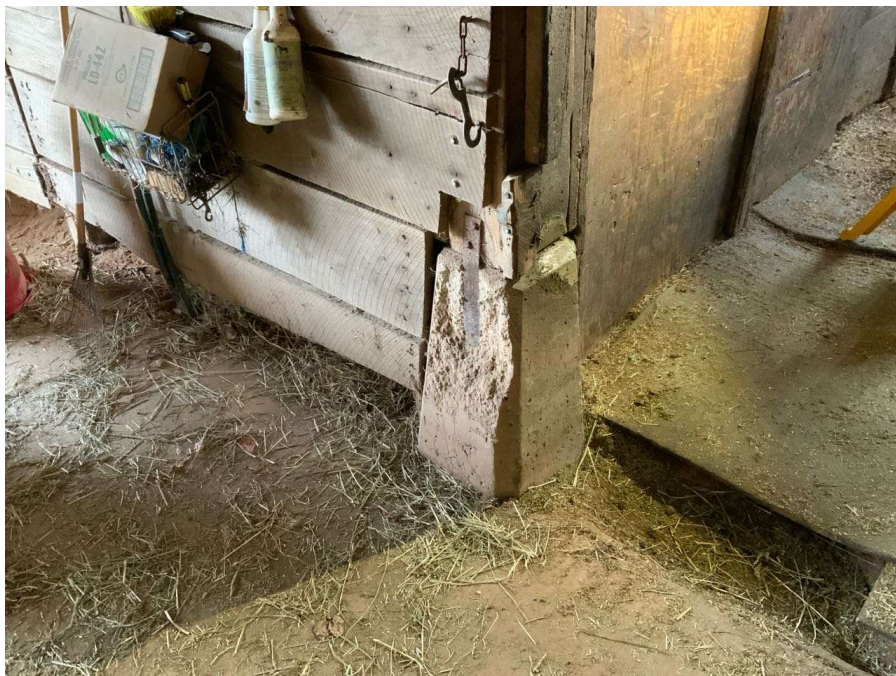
General view of a grade level column supported by a concrete pedestal. Column C/3 shown looking southwest.
